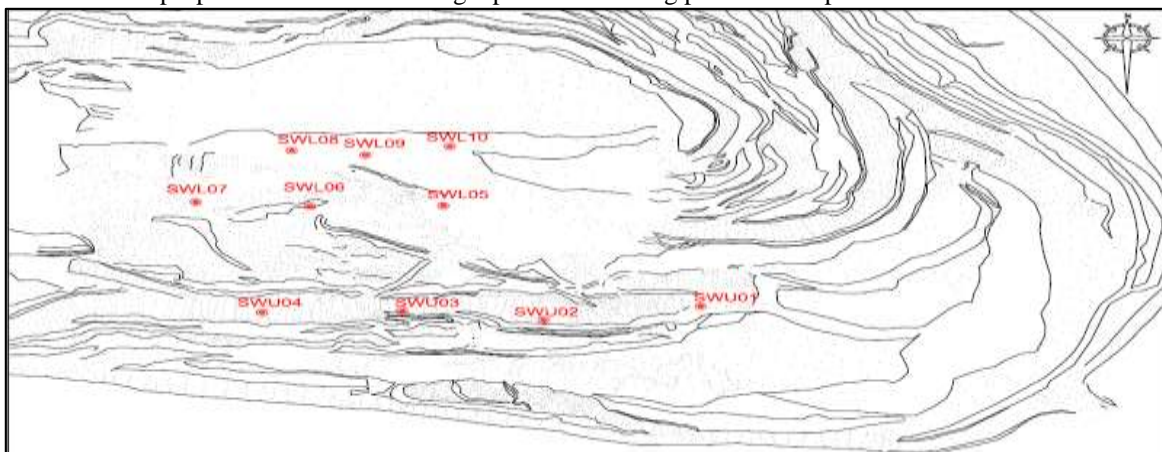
NOP CUTII Foot wall slope location of prisms for survey monitoring of deformations
